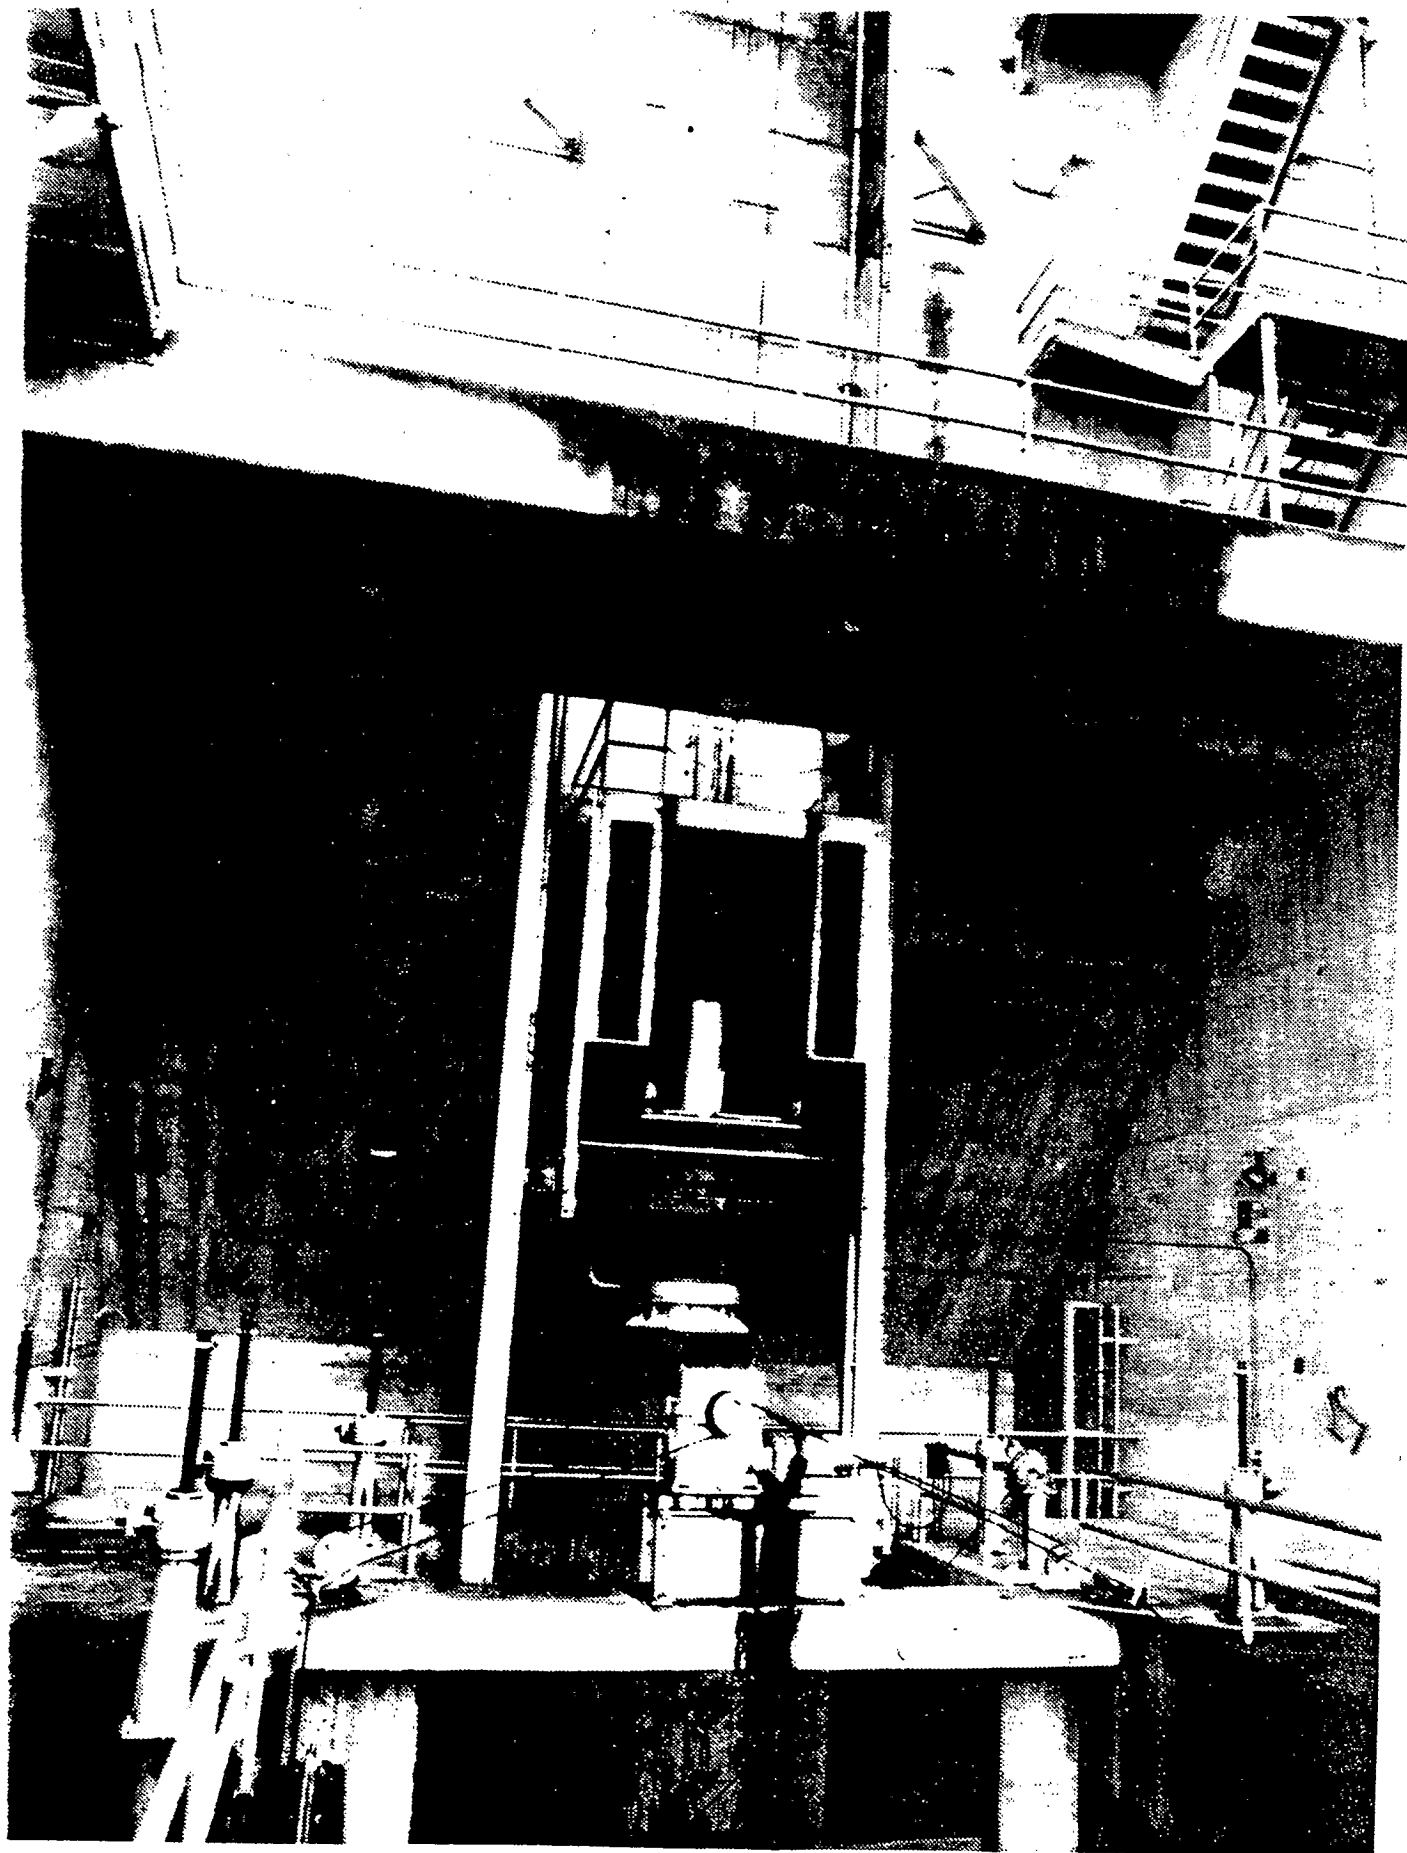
Fish tank elevator being lifted to the loading platform at Keswick Dam.
